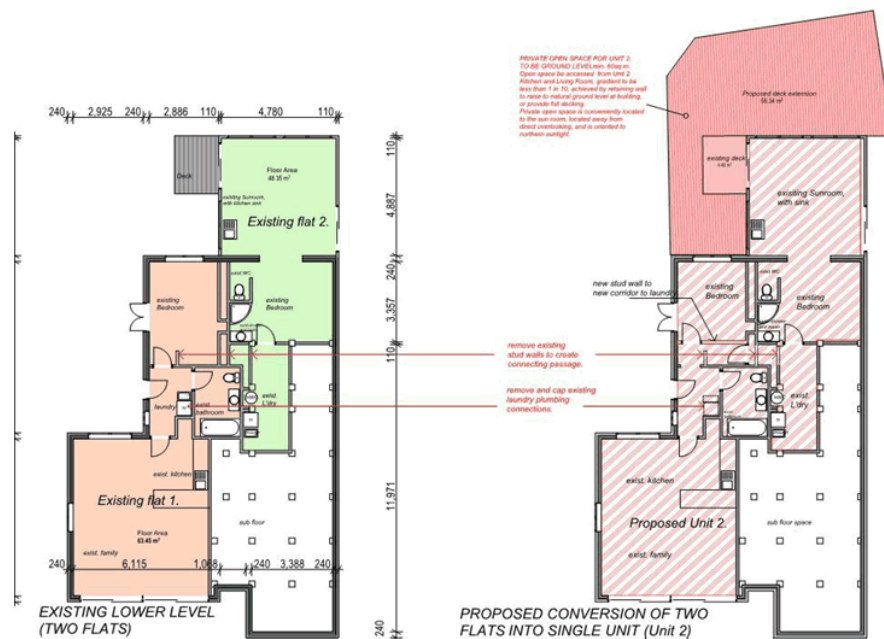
Existing and proposed lower floor plan, to convert the two habitable spaces into one (Stary, 2022)
